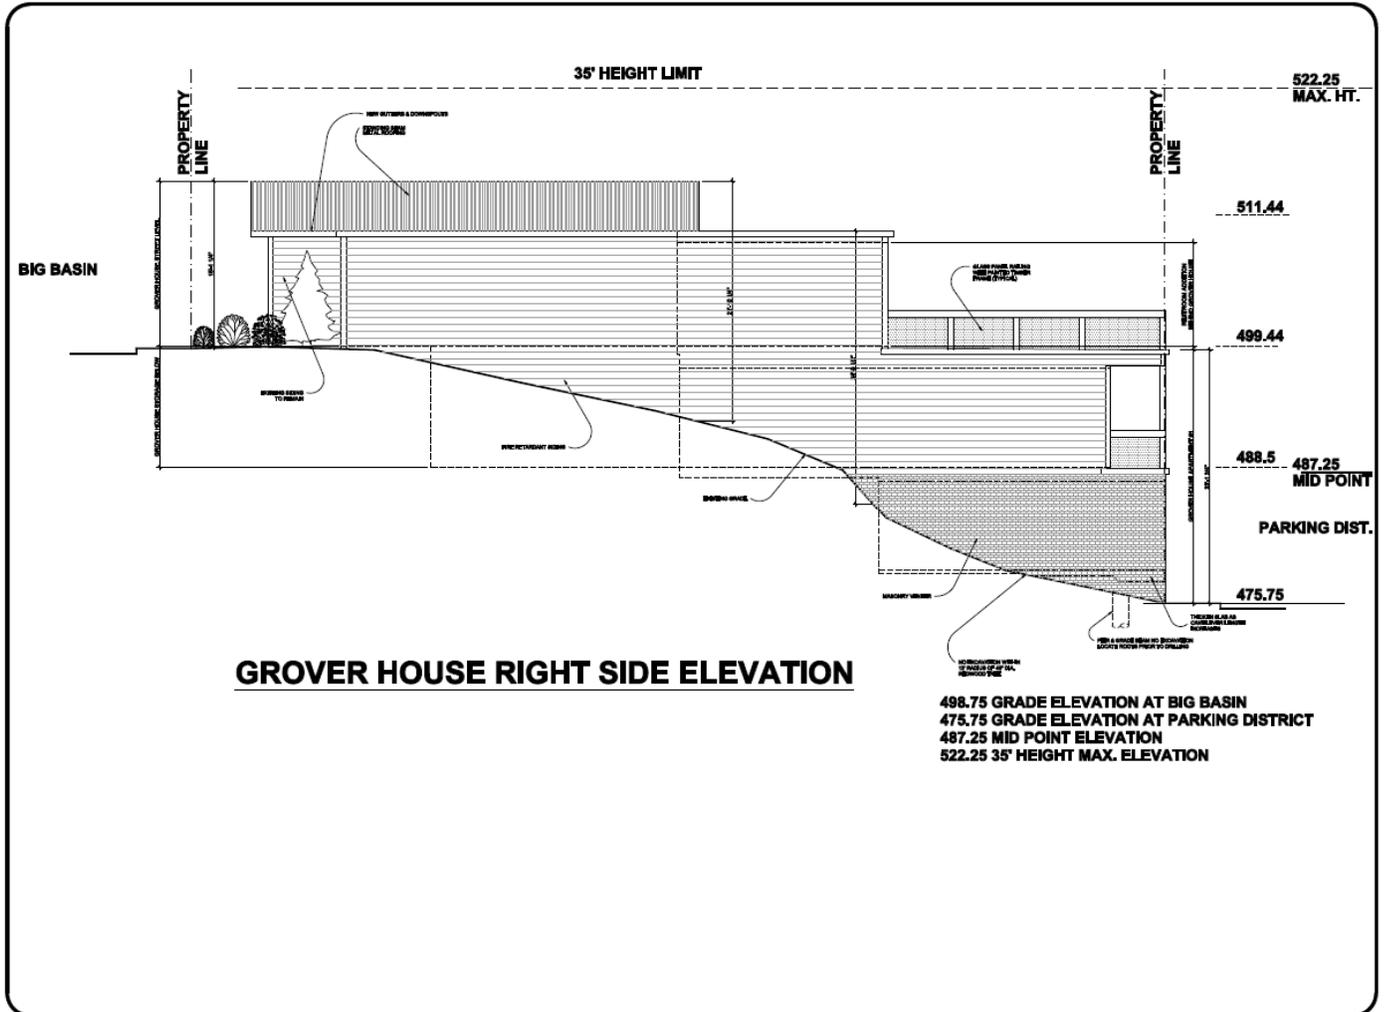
Elevations – Right Side – 14523 Big Basin Way (Blue Rock Shoot)
